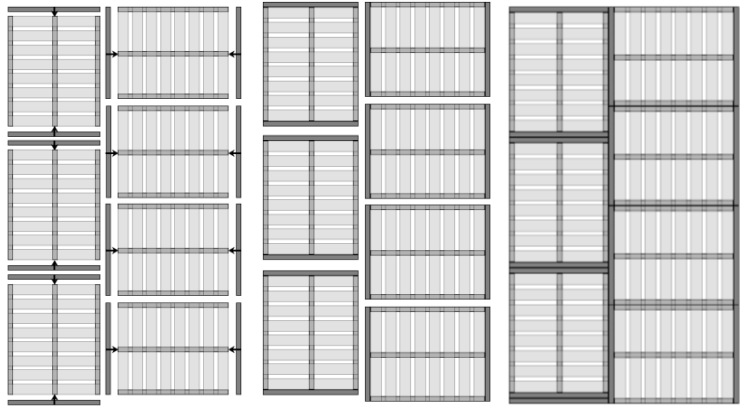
Step 1-attaching the shipping pallets in a pallet house (<http://www.tinypallethouse.com>).
